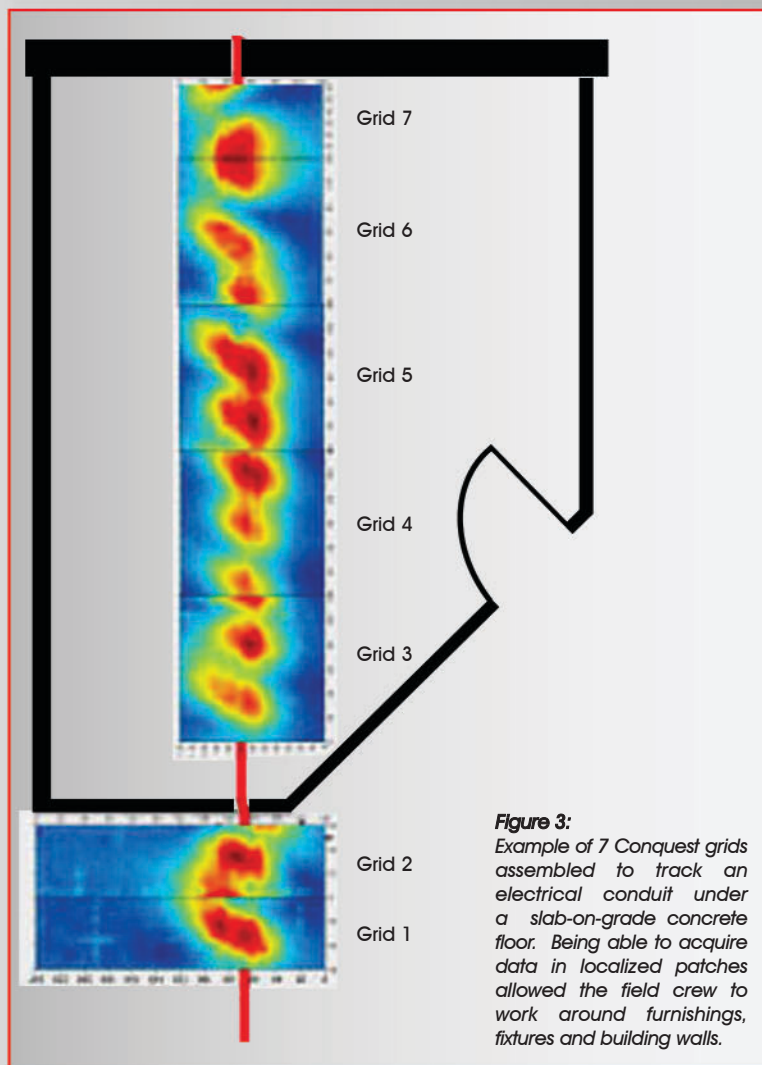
Example of 7 Conquest grids assembled to track an electrical conduit under a slab-on-grade concrete floor. Being able to acquire data in localized patches allowed the field crew to work around furnishings, fixtures and building walls.
